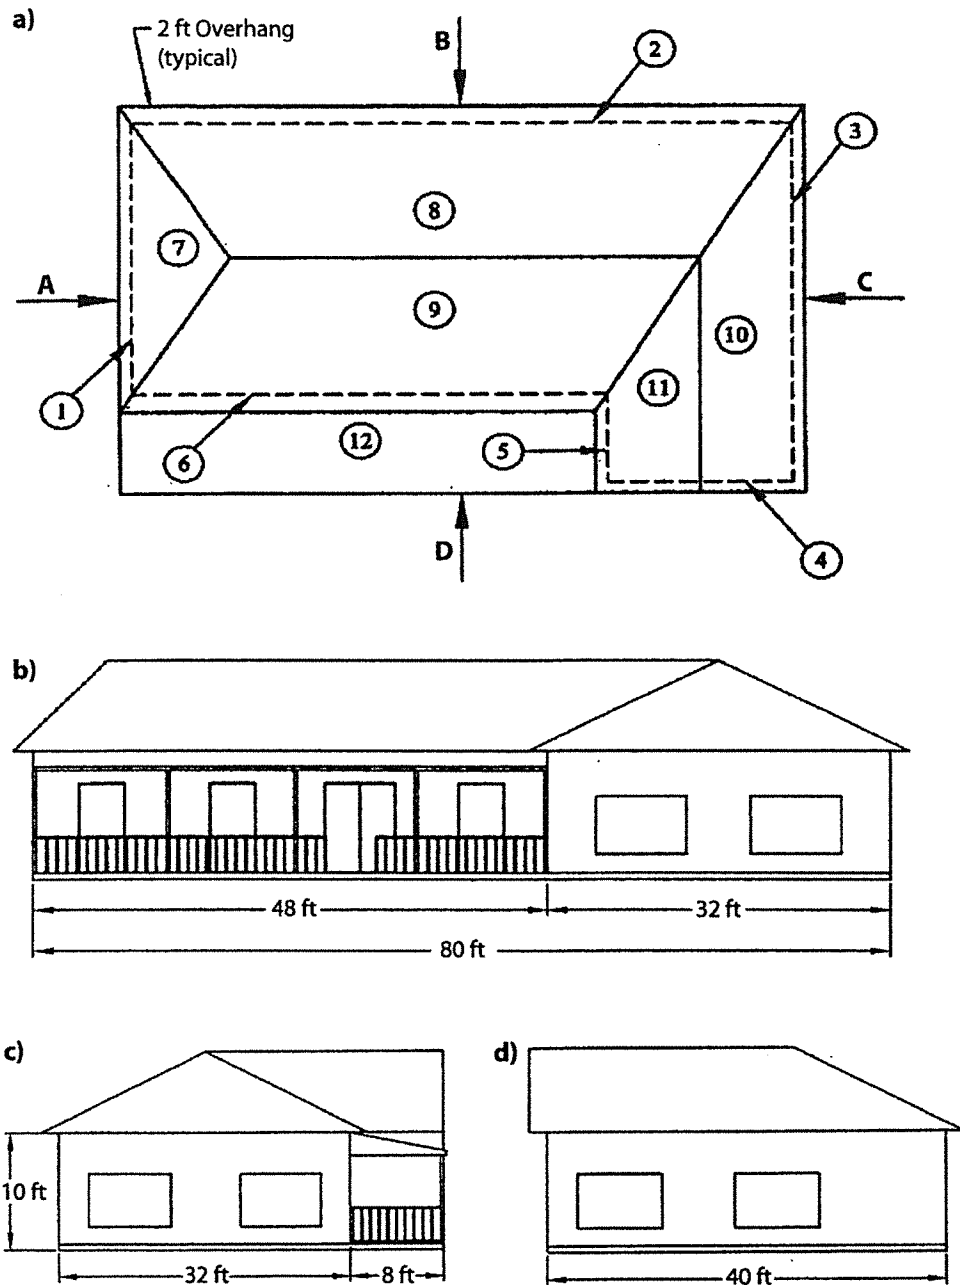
a, View of Roof of 2,500-ft² House; b, Front View D; c, Side View A; d, Side View C
